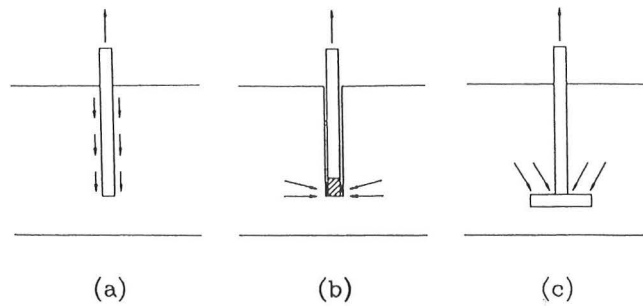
Different ways of transferring the load from the anchor bolt to the concrete, a) adhesive anchor, b) expansion anchor and c) hook anchor.
